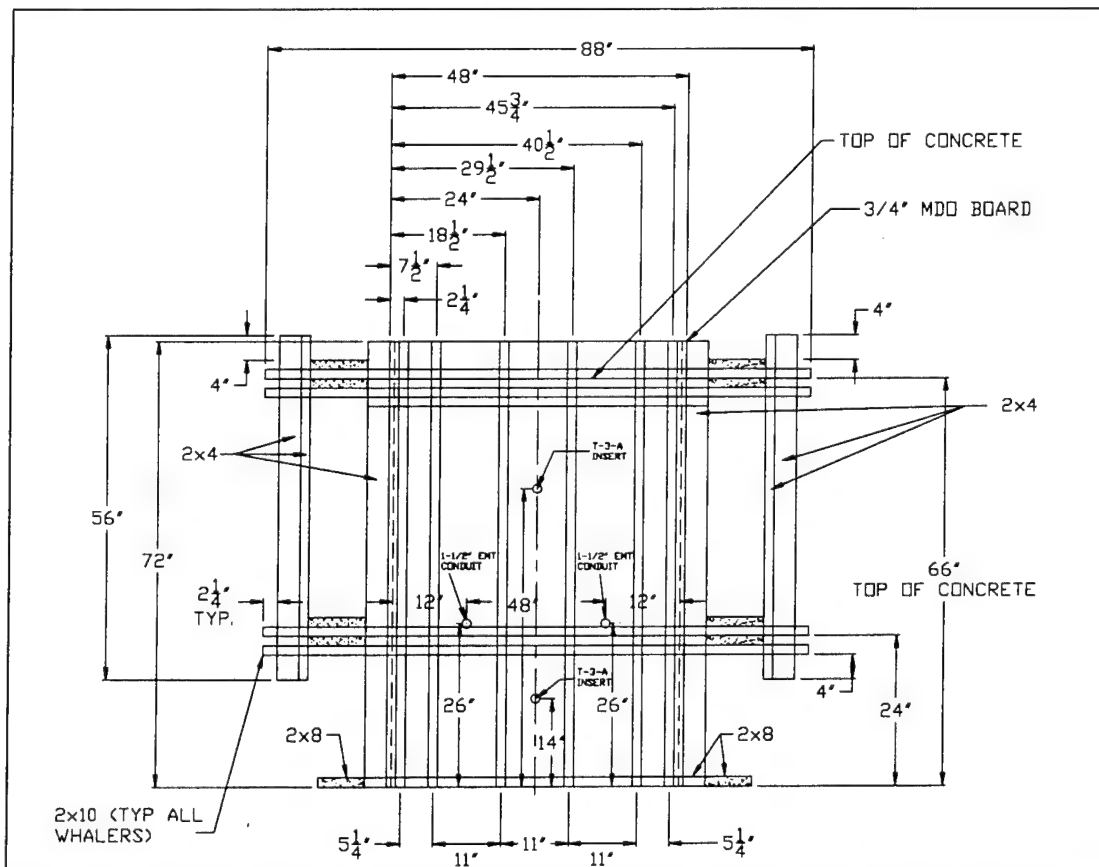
Front elevation view of test block formwork, including insert and EMT locations.
